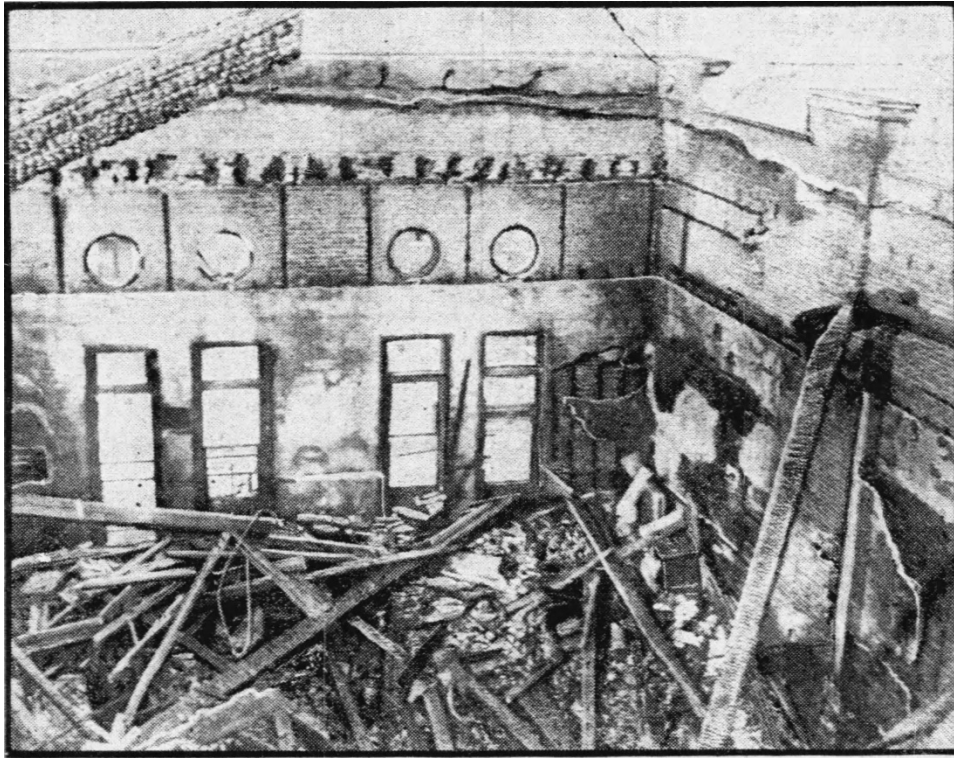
Photograph published in the New York *Daily News* of the Palace Garden Hall after the January 1923 fire. The perspective is uncertain, though the viewer might be looking toward Washington Street (Source: Newspapers.com).
